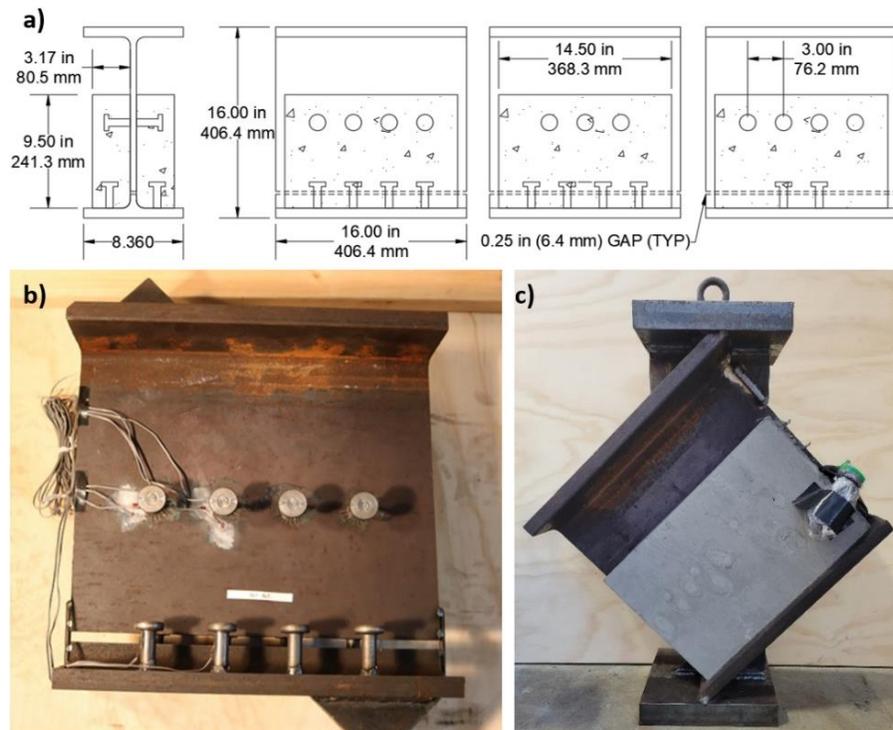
a) CAD model of the three specimen configurations investigated, b) fabricated specimen with strain gauges prior to casting, and c) completed specimen with UHPC panel and support plates.
